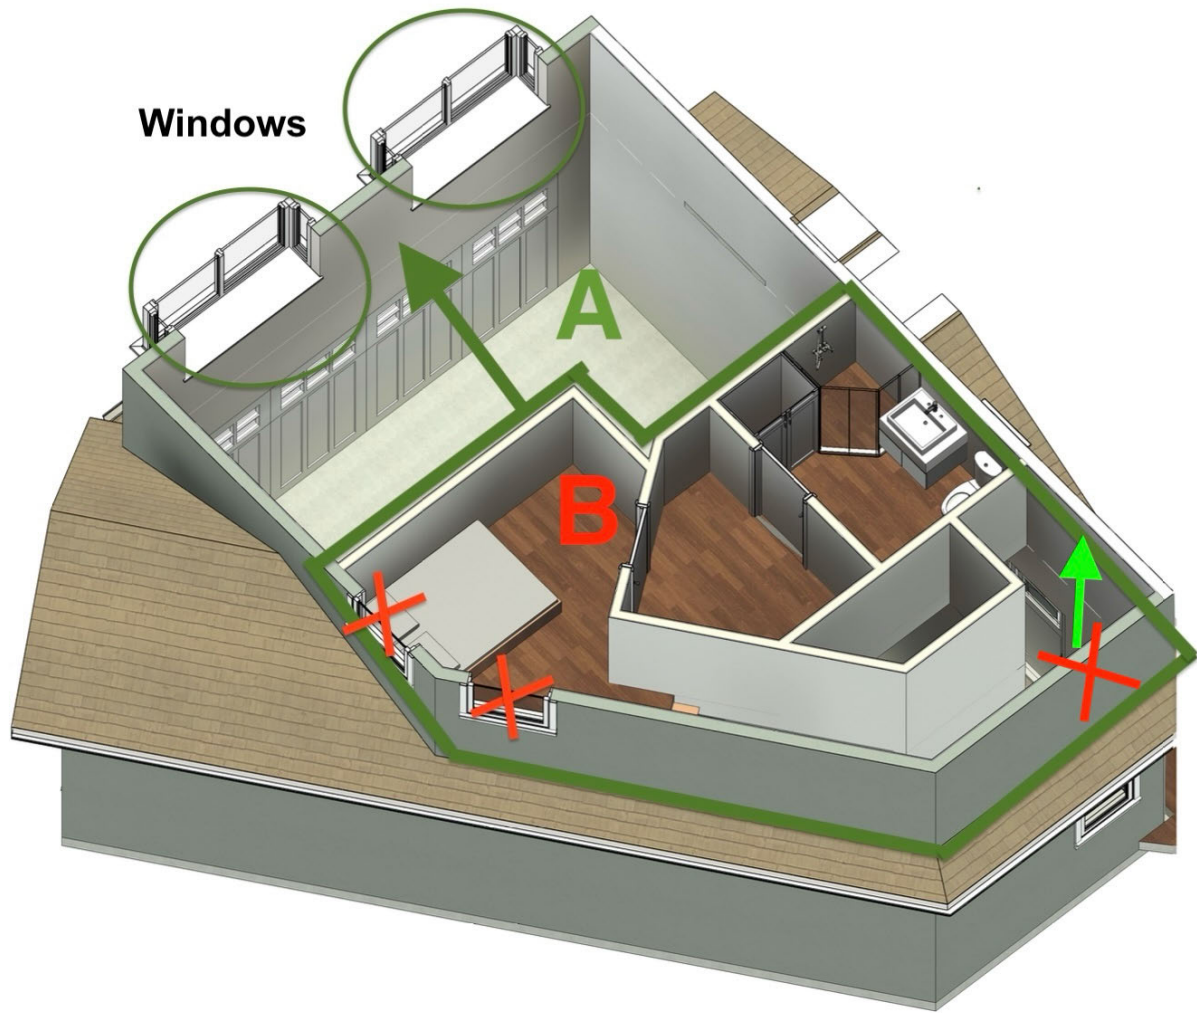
Proposal to construct the living area in A and eliminate the side windows and area B.
